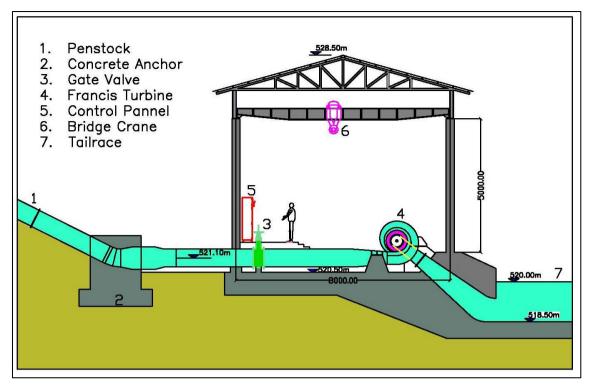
2 Longitudinal Section of the Forebay Tank, Pen stock and Power House
